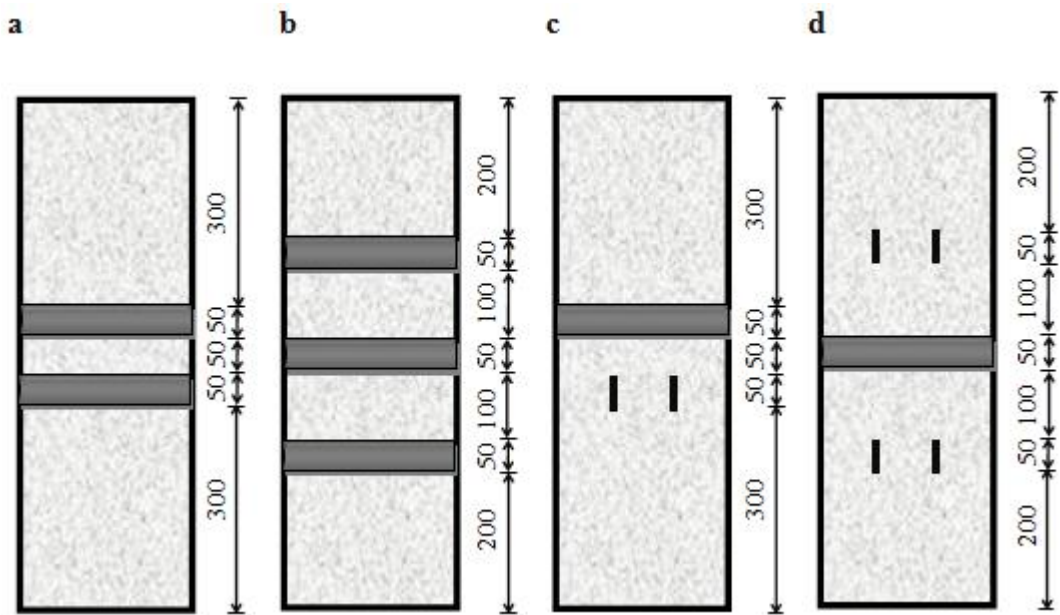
Typical elevations of stiffened CFSC columns ($L = 750$ mm): (a) columns with C1 or C3 steel stiffeners, 2 stiffeners with width and spacing of 50 mm, (b) columns with C1 or C3 steel stiffeners, 3 stiffeners with width of 50 mm and spacing of 100 mm, (c) columns with C2 steel stiffeners, 2 stiffeners with width and spacing of 50 mm, (d) columns with C2 steel stiffeners, 3 stiffeners with width of 50 mm and spacing of 100 mm; (dimensions are in mm)
